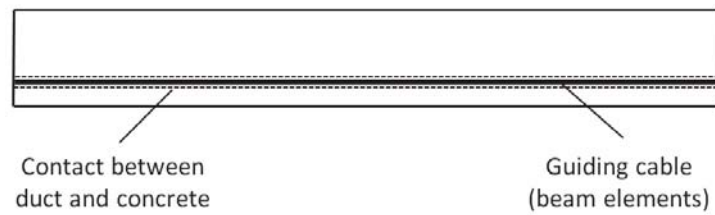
The prestressing duct (beam elements) are coupled to the surrounding concrete (solid elements).
